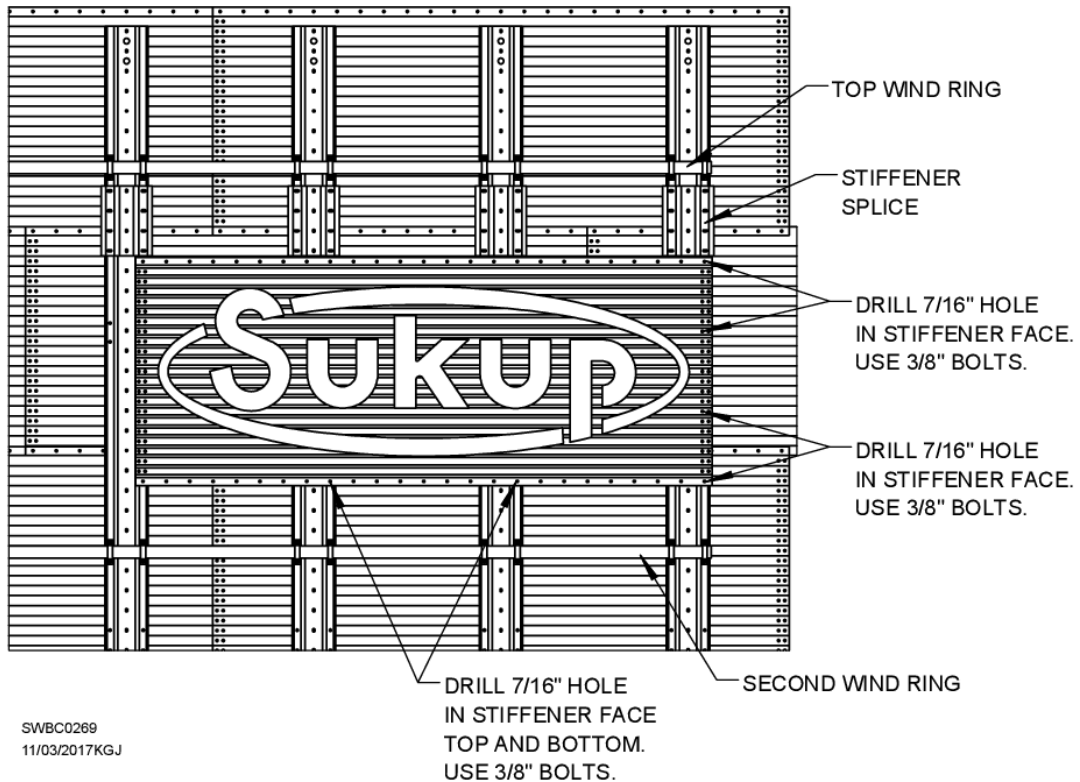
Attaching Sukup logo sheet to bin with three stiffeners per sidewall sheet
